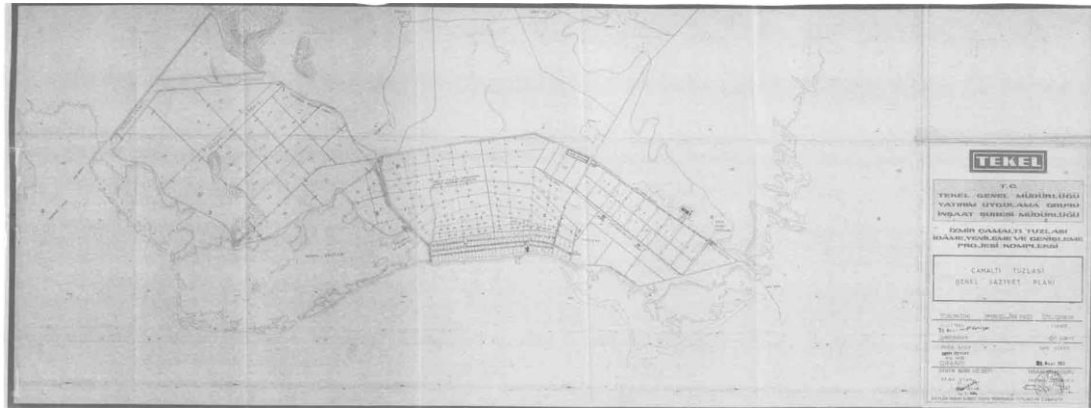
Expansion and development plan, 1983 (TTA Gayrimenkul Archive)
